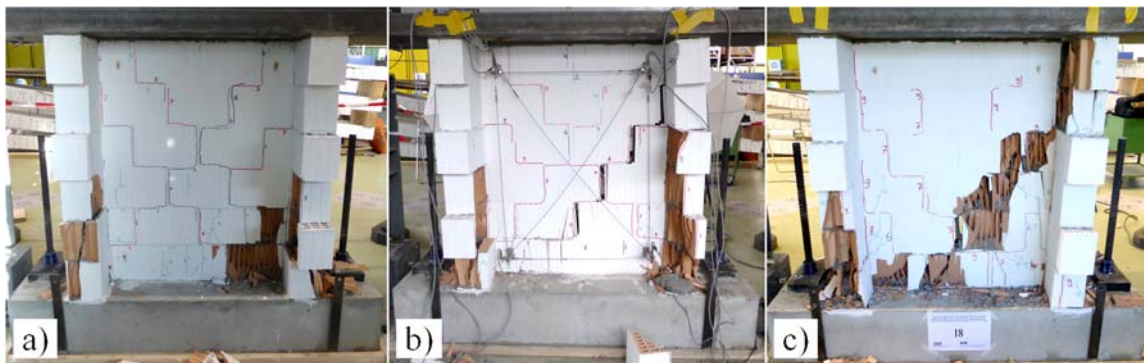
Crack patterns observed on the I-shaped wallettes of the second test series: a) Wallette I5; b) Wallette I6; c) Wallette I8 [57]
